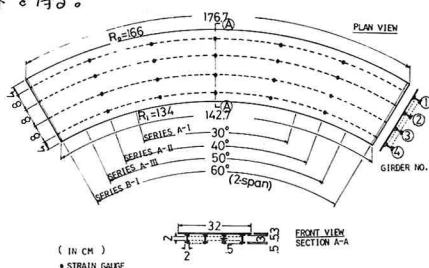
STRUCTURAL DETAILS OF CURVED GIRDER BRIDGES AND SUPPORT LOCATIONS
